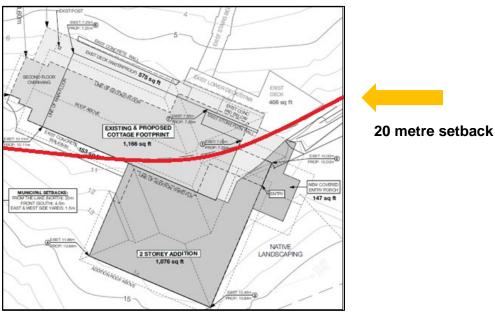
Proposed Addition to existing Single Family Dwelling under BP001554
